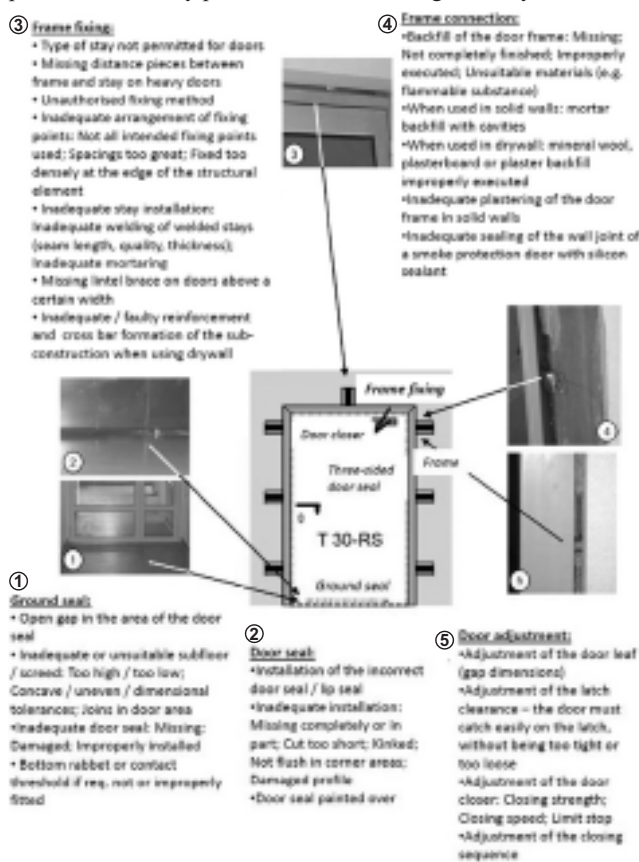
Selected defects in fire doors in construction phase of new buildings – details of the frame fixing and connection, seals and door adjustment [6]
